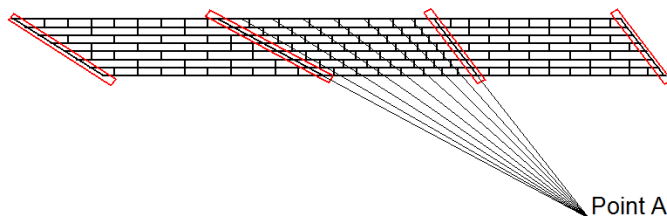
Beneficial Staggered Diaphragm or Cross-Frame Framing Arrangement for a Straight Bridge illustrating a “Fanning” of the Diaphragm or Cross-Frame Work Points within the Center Span
